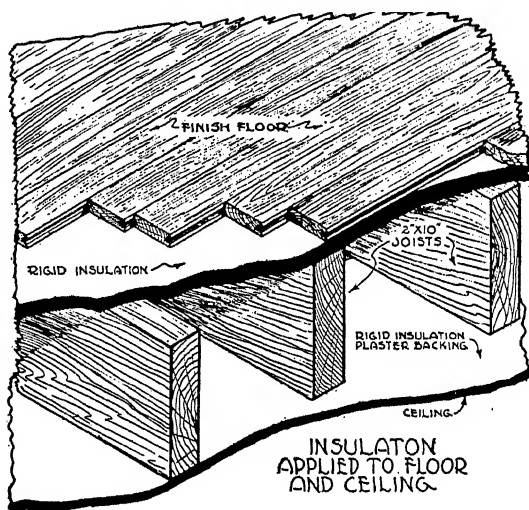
Use of Rigid Insulation in Floor and Ceiling
